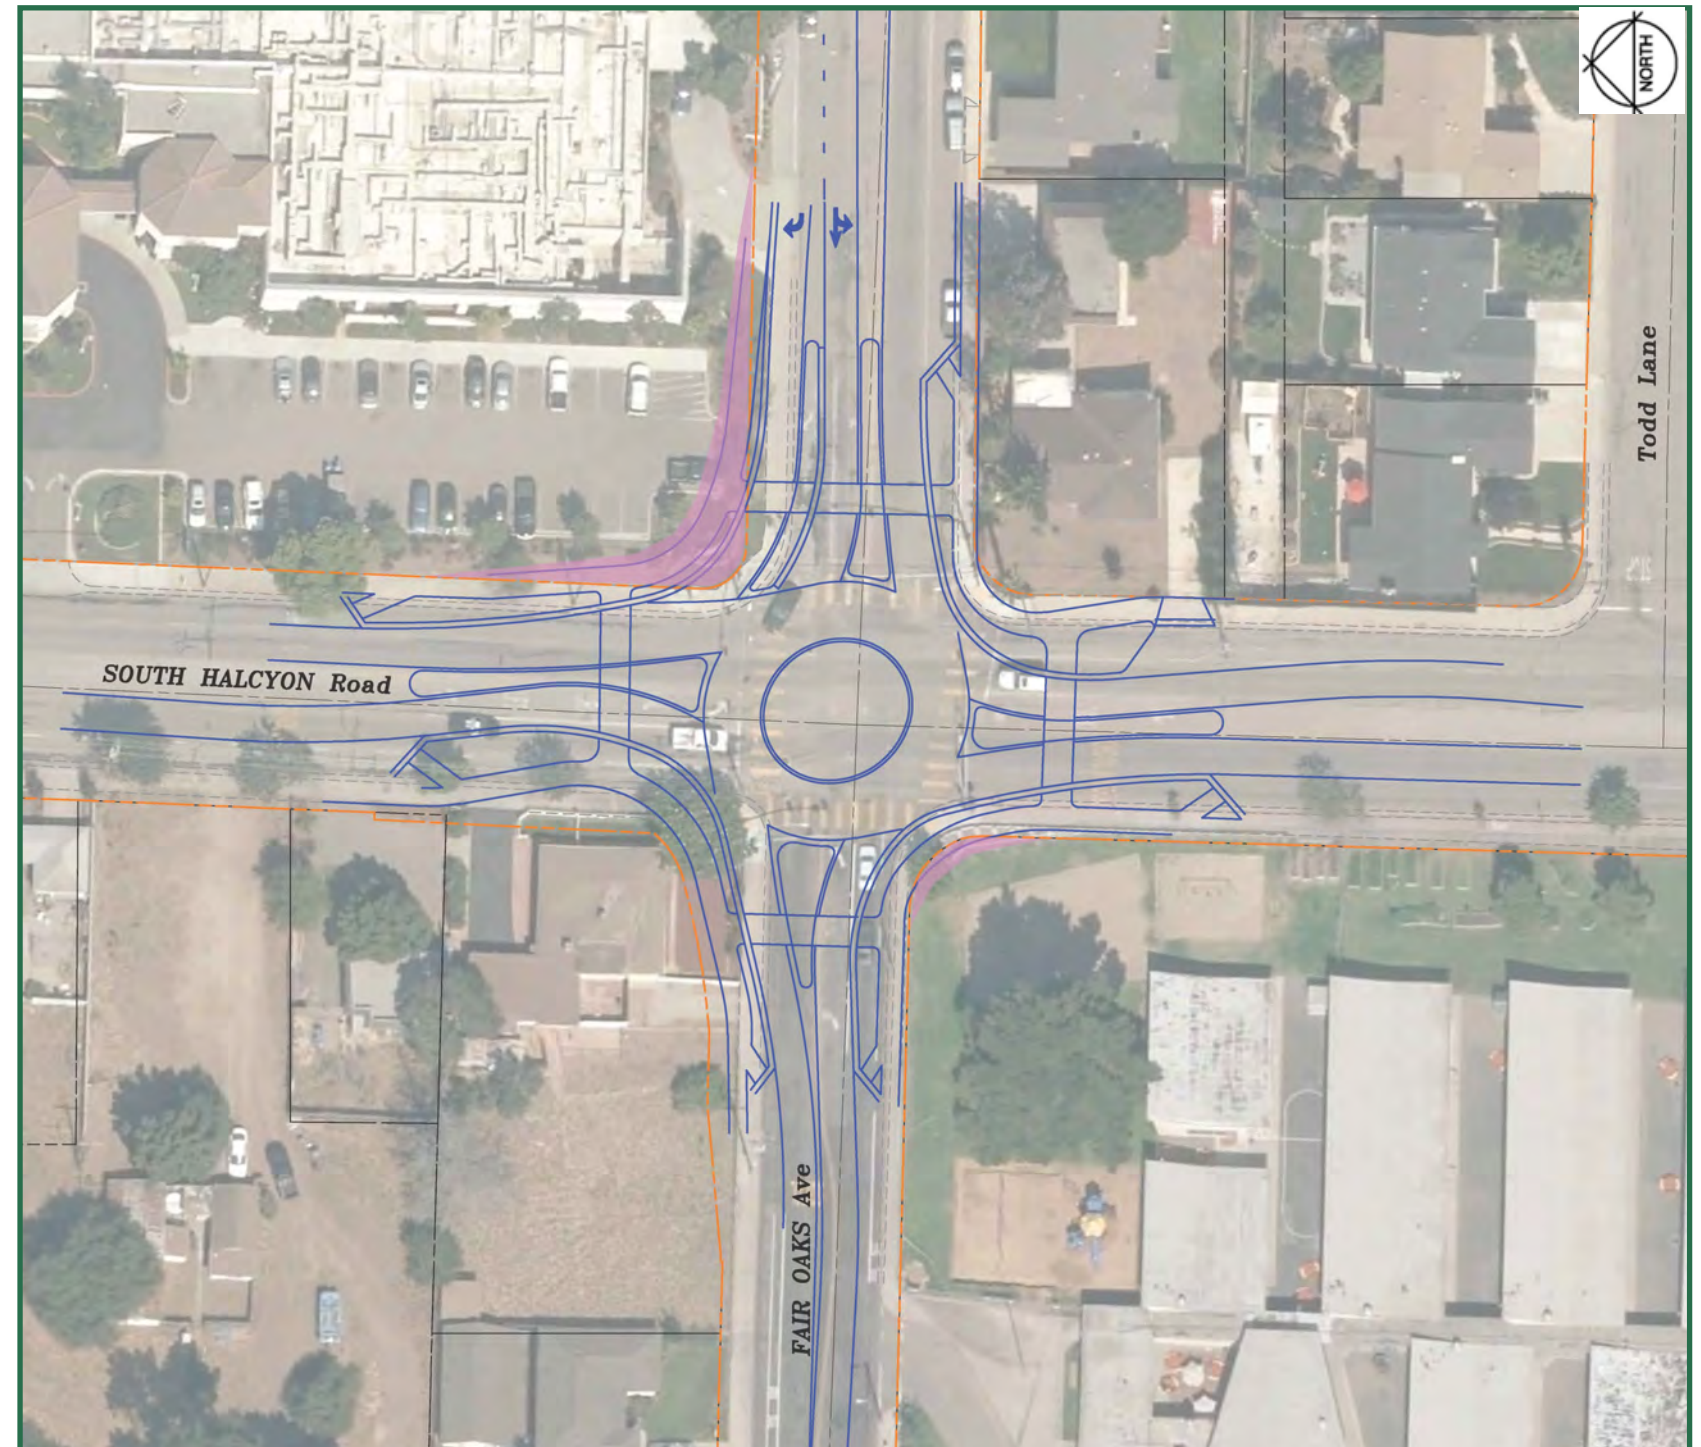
above presents the potential right-of-way impacts at the intersection and along Halcyon Road and Fair Oaks Avenue for Alternative 2. As shown, the proposed roundabout would encroach into the right-of-way at the northeast and southwest corners of the intersection, and would not affect existing building structures. The right of way dedication required for the northwest corner was provided with the recordation of Tract Map 3101 in April 2022. The proposed concept would be further refined in its design in the future if selected.
